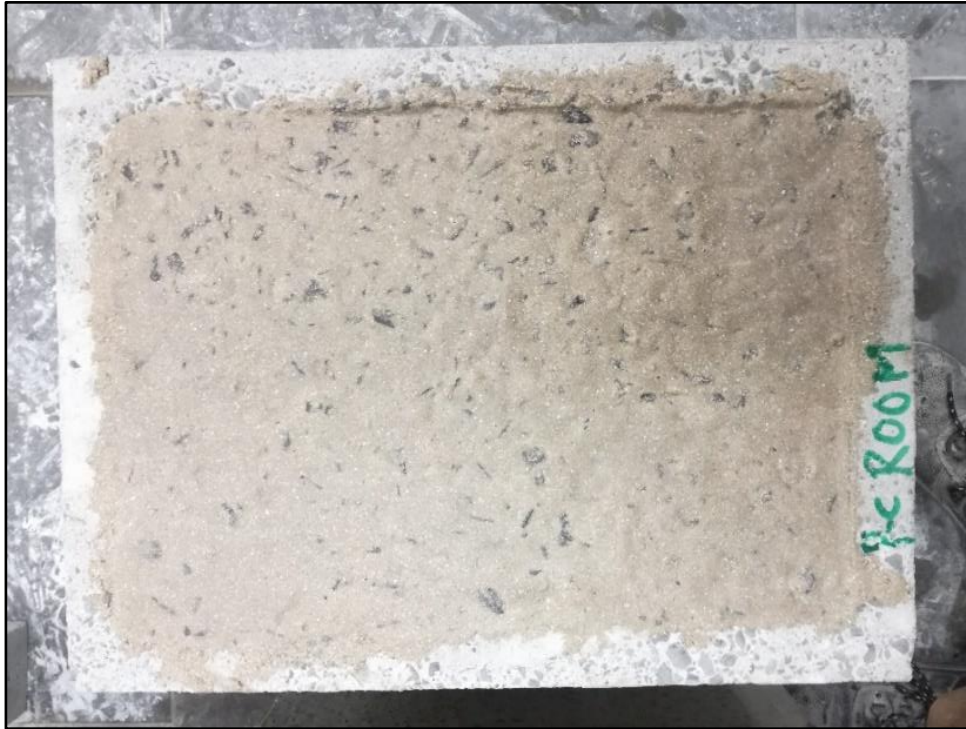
Polymer-cement concrete FA patch repair left under room conditions
